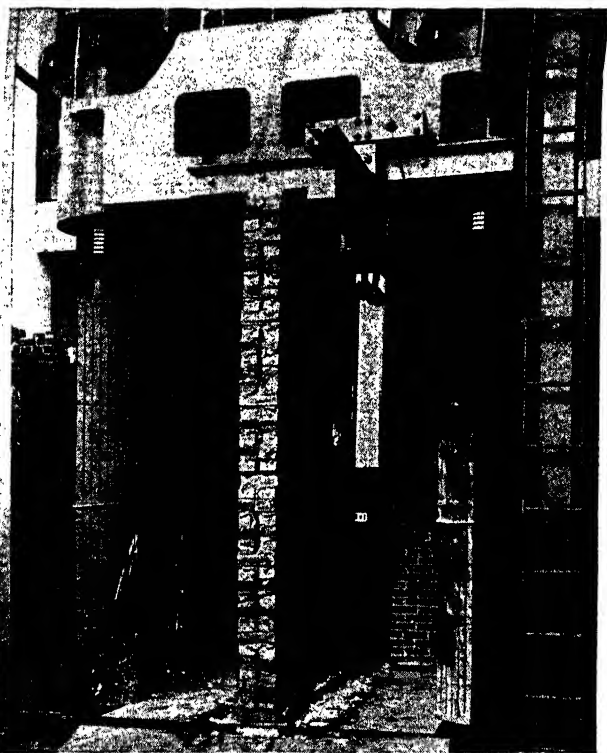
Testing an 8-in. solid brick wall for load-bearing capacity at National Bureau of Standards, Washington, D. C. Interior joints in this wall are unfilled.
